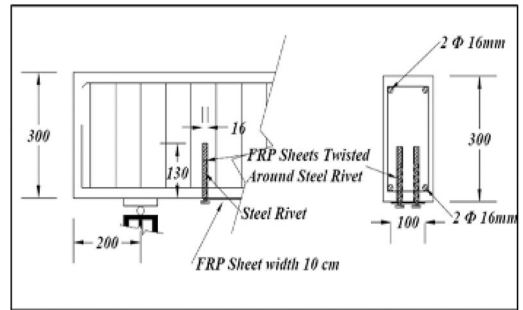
Beam strengthened with CFRP sheets wrapped on two vertical drilled bolts.
